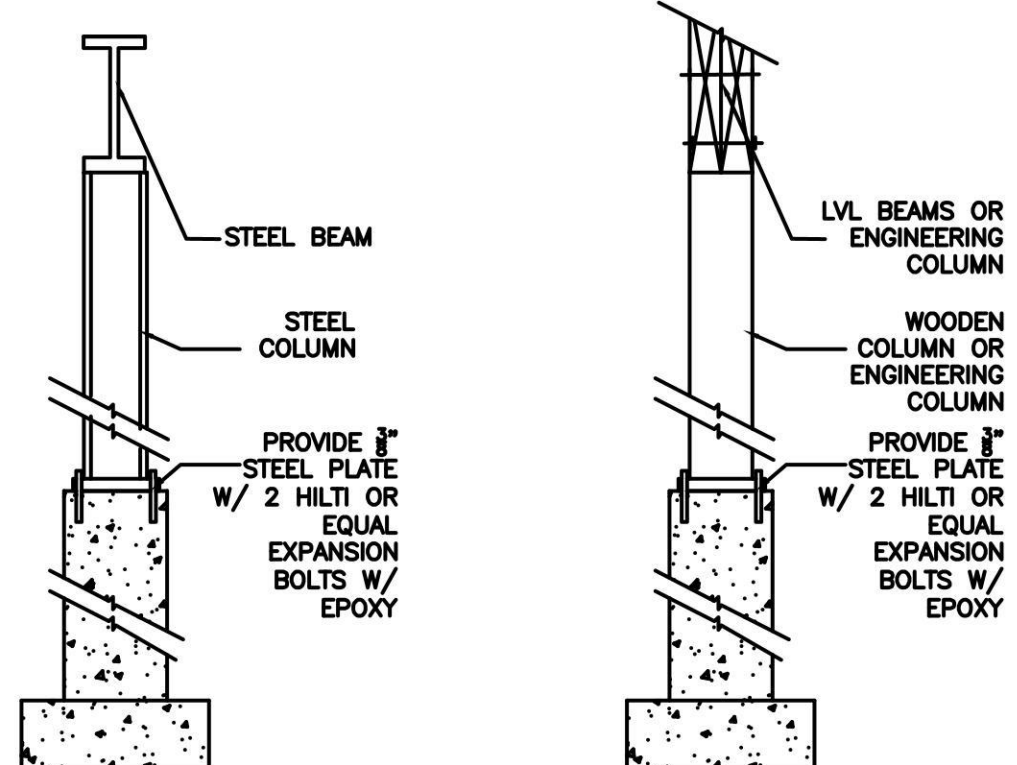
DETAILS (B) FOR POST TO BE SUPPORTED ON NEW CONCRETE WALL
